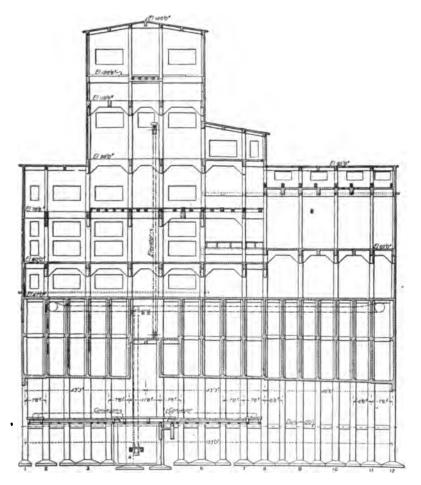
Longitudinal Section B-B, Taylor Reinforced Concrete Breaker.
